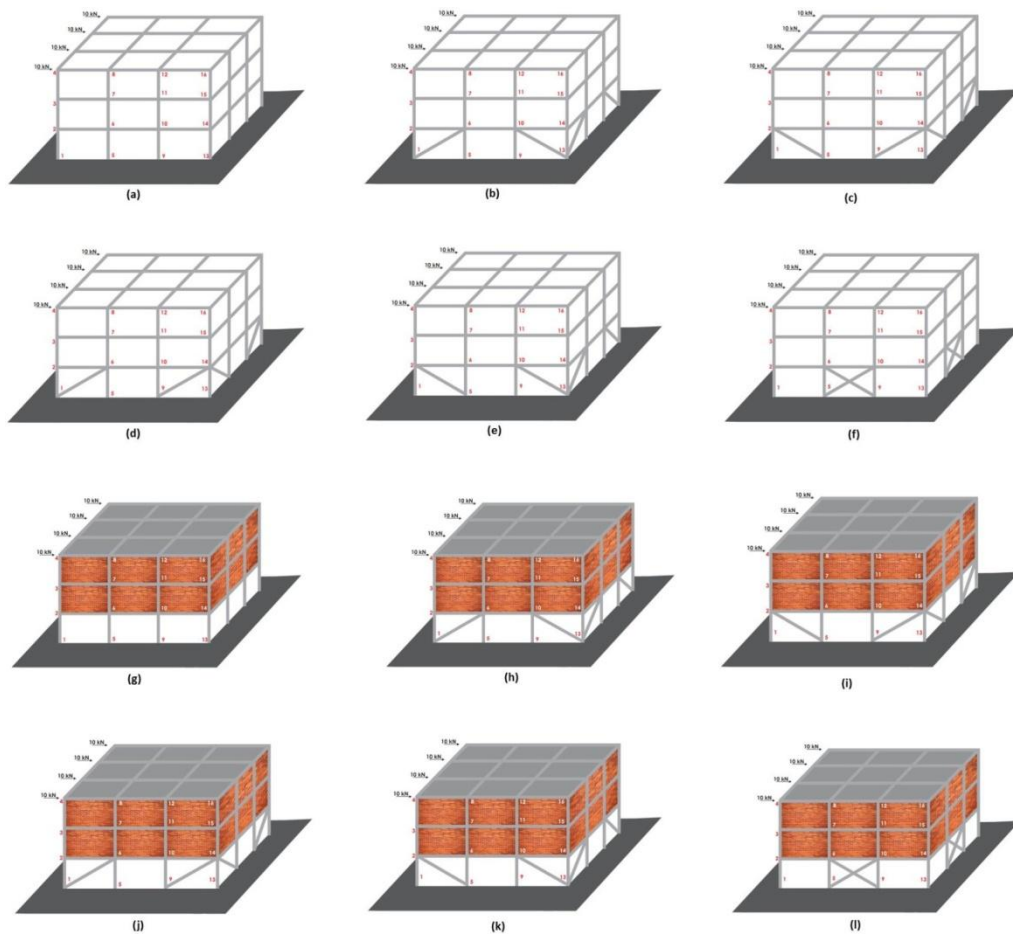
Three bay by three bay two storeyed building (a) – (f) without infill walls with possible orientations of bracings (g)-(l) with infill walls.
